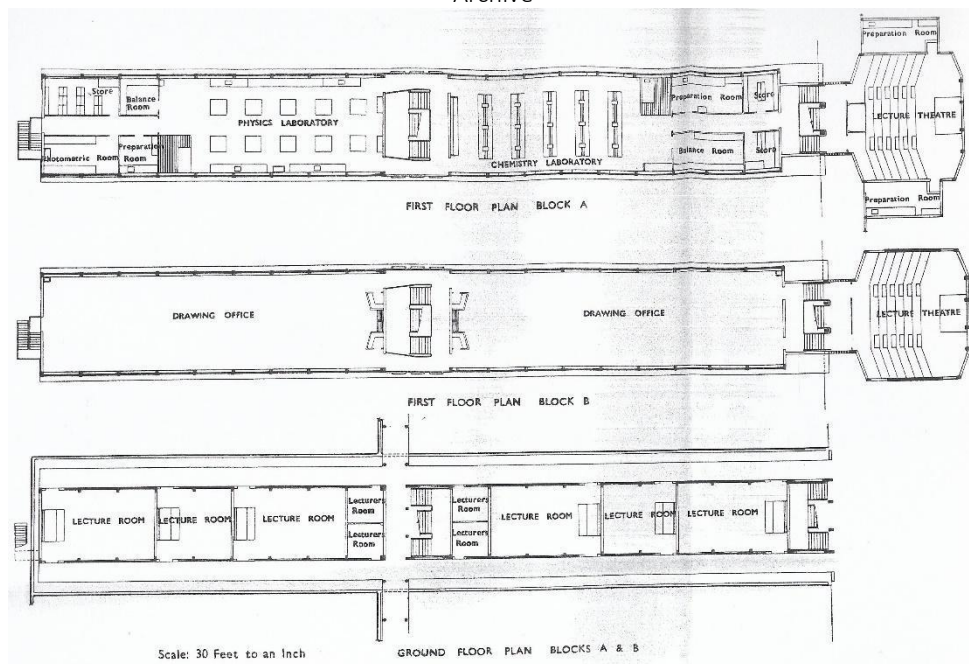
Ground Floor Plan of learning facilities at Block A & B
